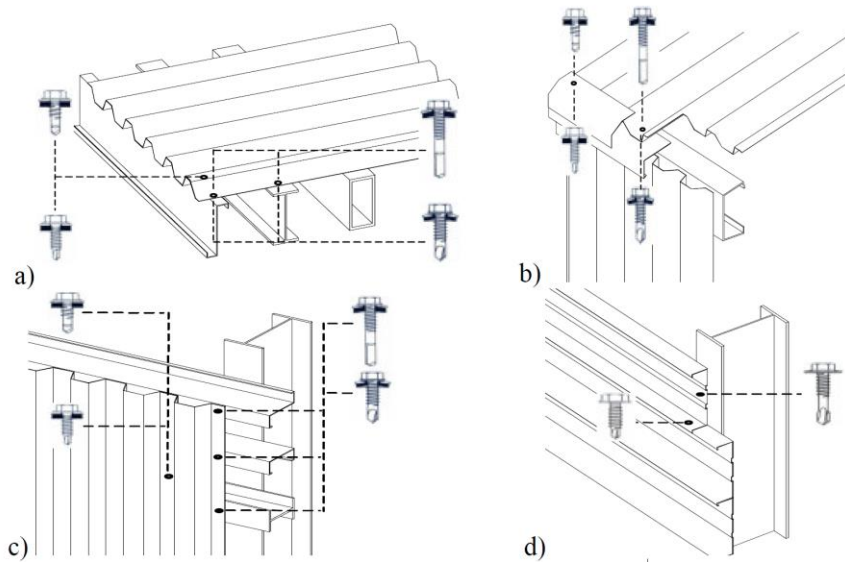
(a) fastenings of roof sheeting on purlins; (b) fastening of sheeting at an eave detail; (c) fastening of wall sheeting on side rails; (d) fastenings of wall cassettes on stanchions.
